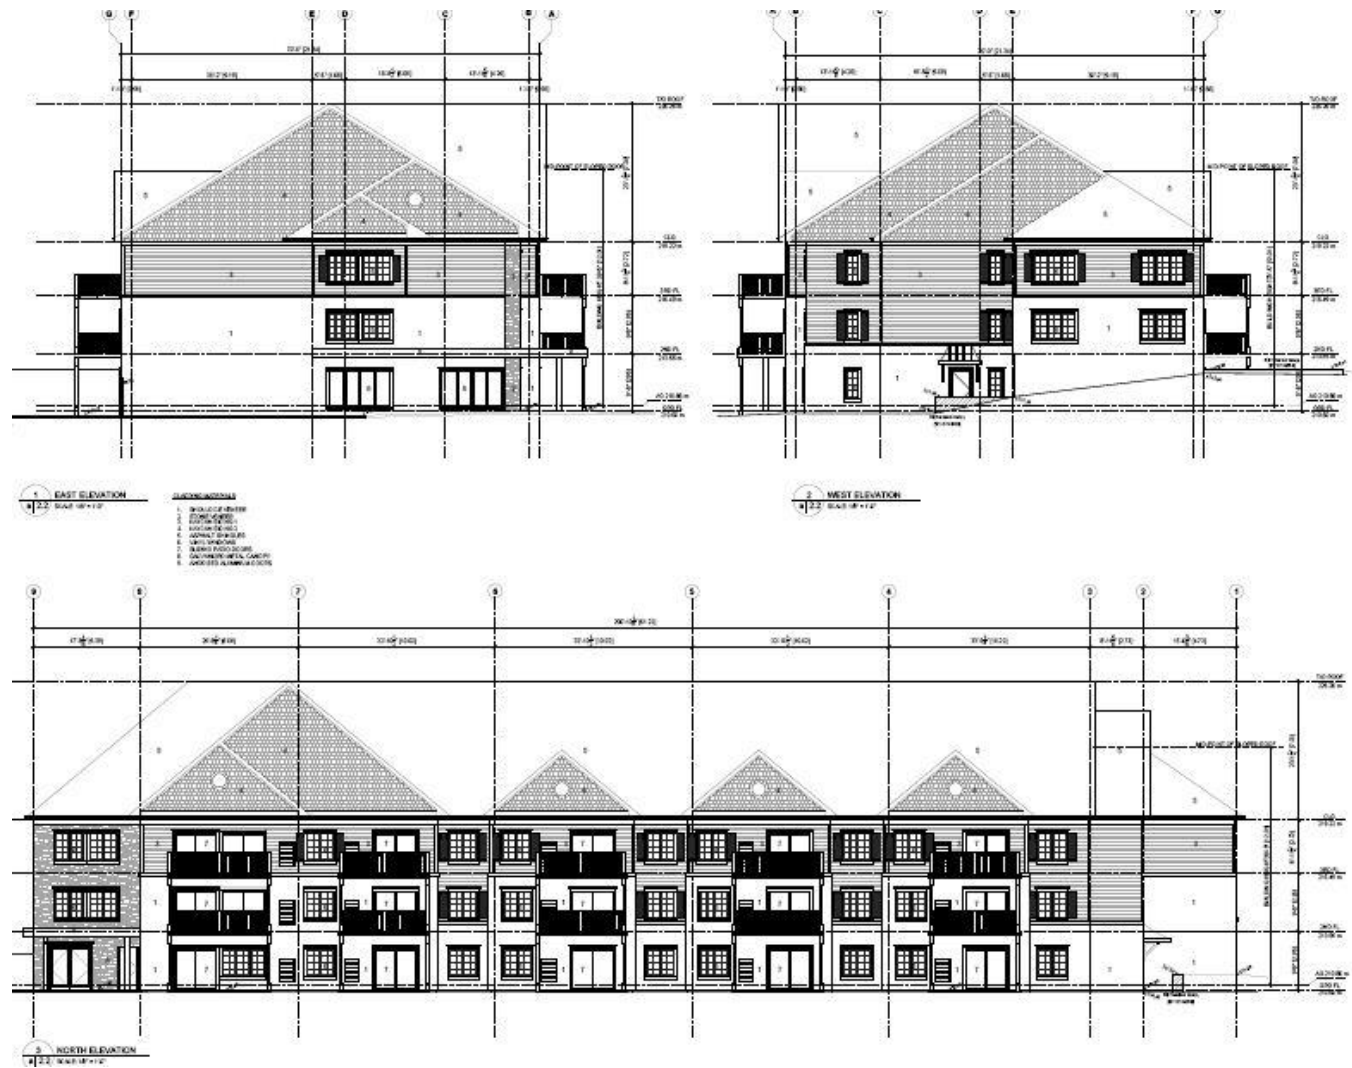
## Exhibit B – Site Plan, Site Details, Page 4 of 6
